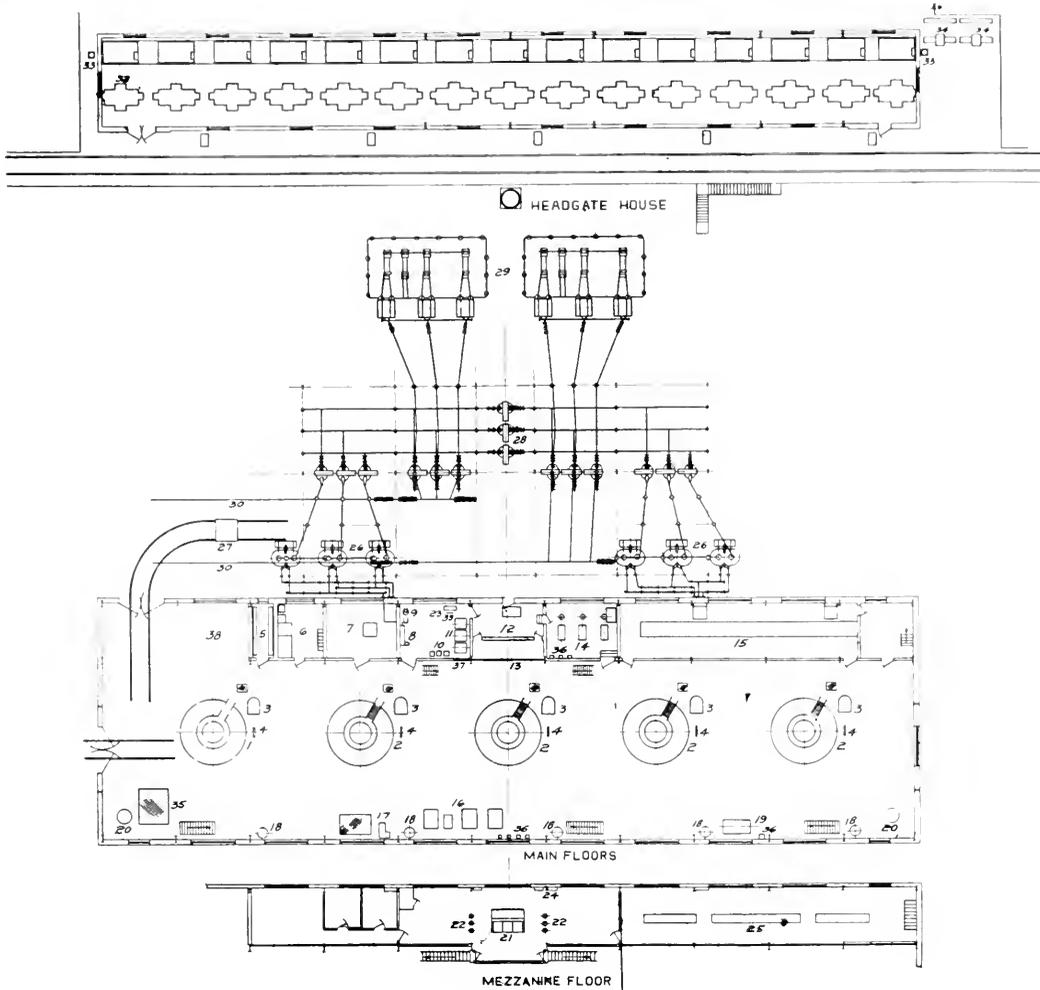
Plan of the Headgate House, Outdoor Station, and Power House
